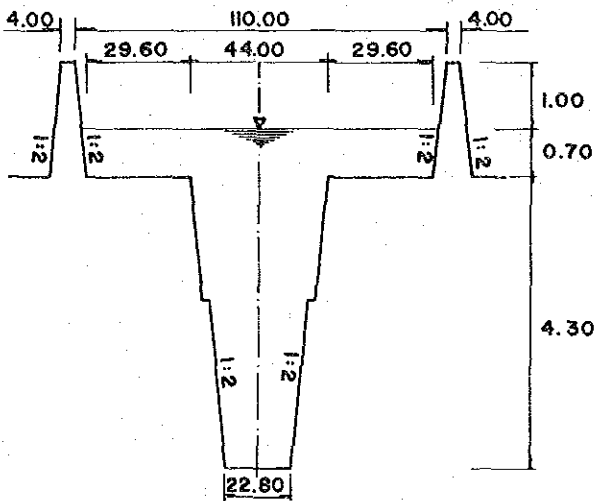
TYPICAL RIVER CROSS-SECTIONS FOR COMPREHENSIVE PLAN (1/5)
